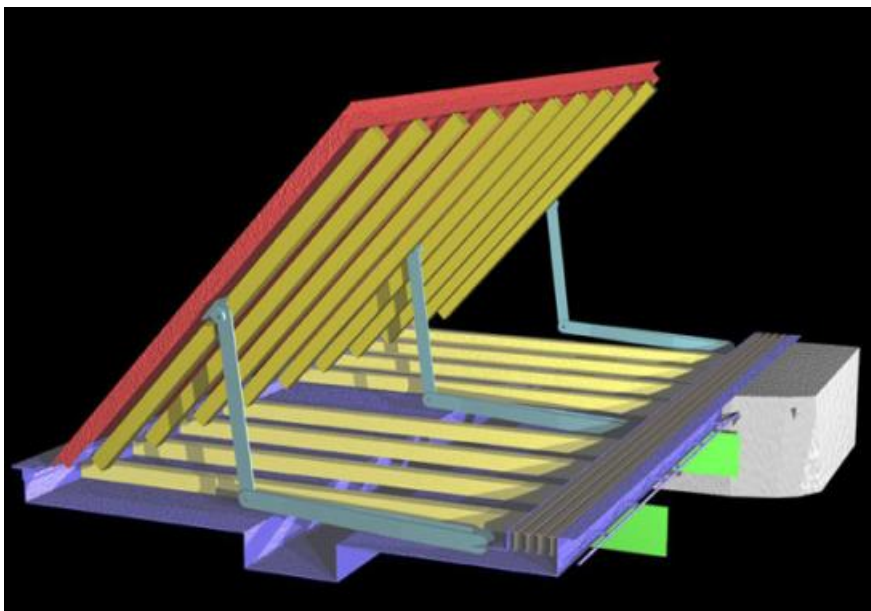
Automatic Roadway Floodgate. Source: (Flood Break , 2016)
